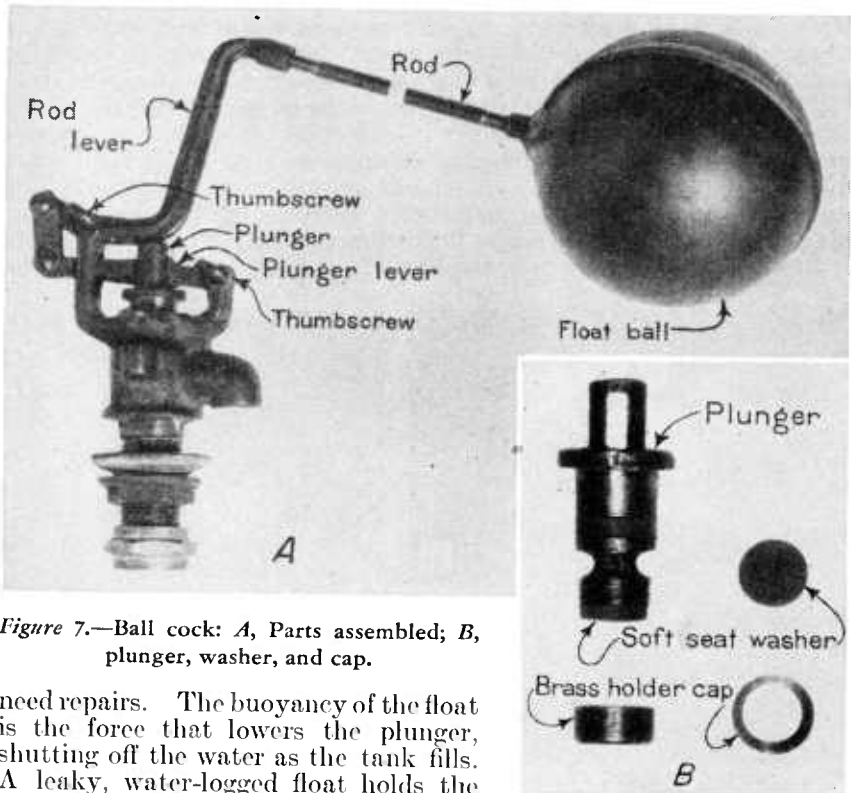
Ball cock: A, Parts assembled; B, plunger, washer, and cap.
